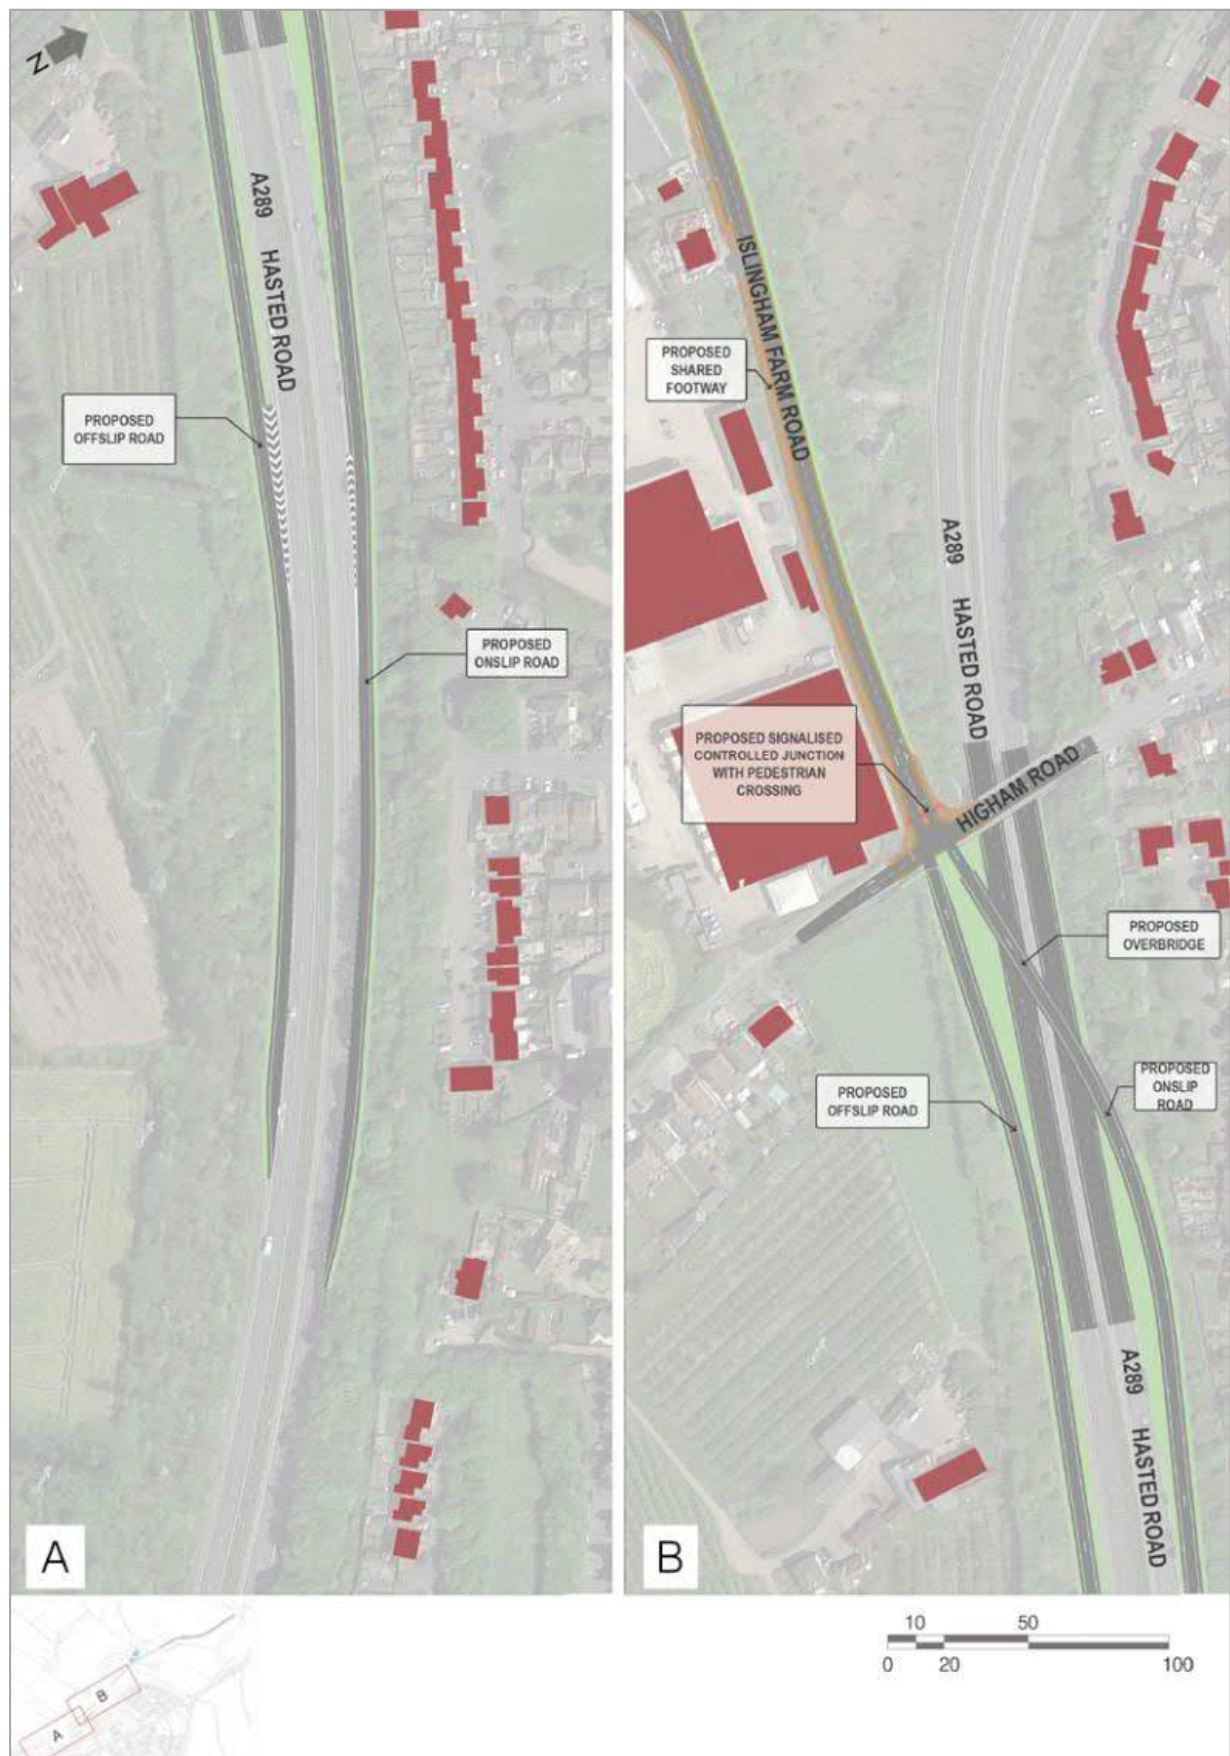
Phase 1 - Modifications to A289 including providing proposed slip roads to Higham Road Slip Road to Higham Road junction, new overbridge, improvements to Islingham Farm Road and Woodfield Way
